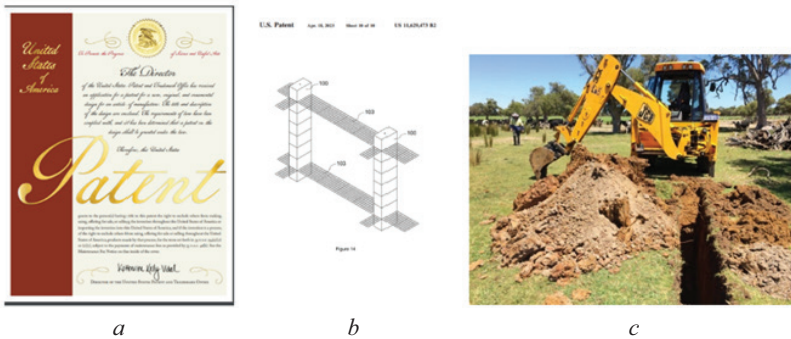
The USPTO patent document cover (a); geogrid connection system (b); trench excavation for piles (c)
